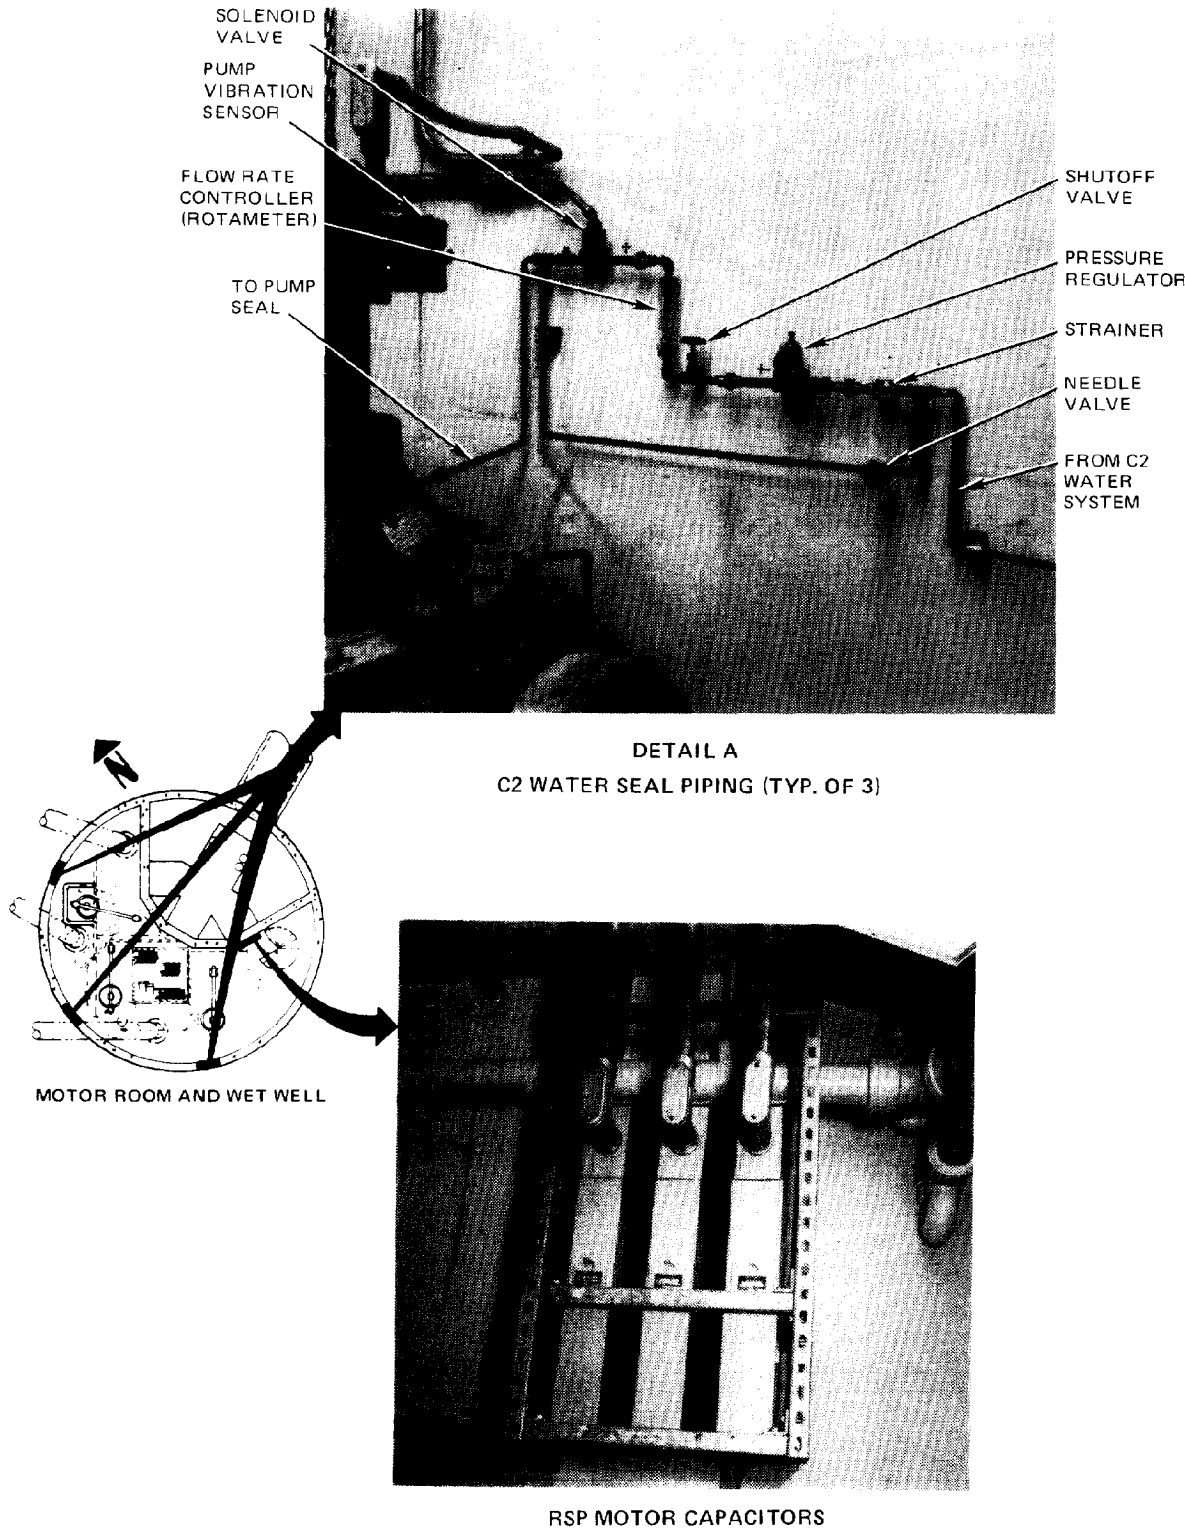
Raw Sewage Pumping System Equipment (Sheet 4 of 5)
